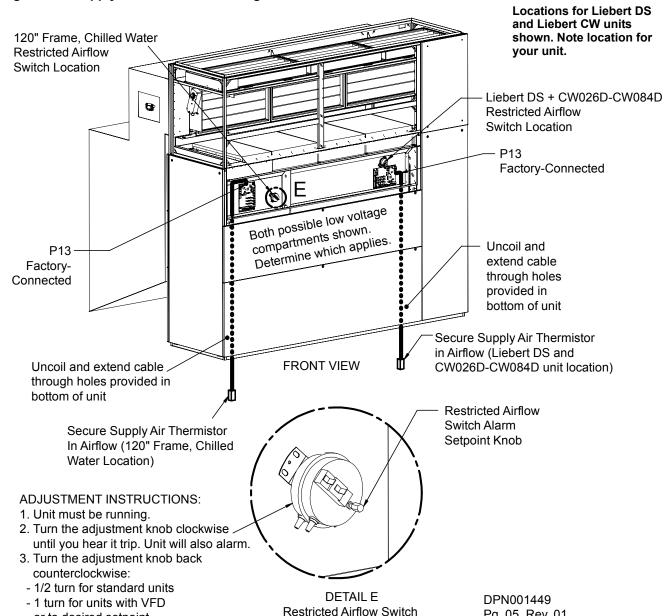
Supply limit thermistor wiring and restricted airflow switch location
